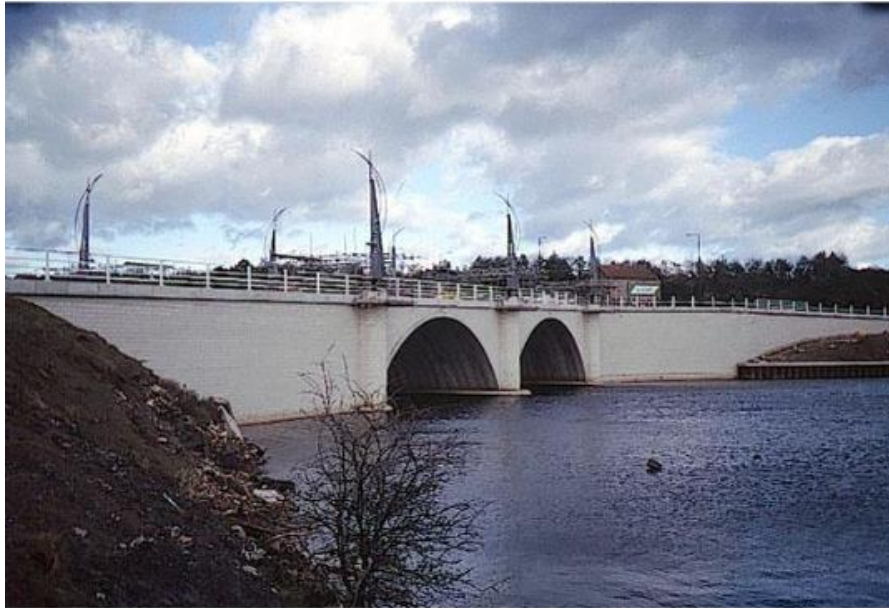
Leamington Gut Bridge, River Tyne, UK, 2000.
